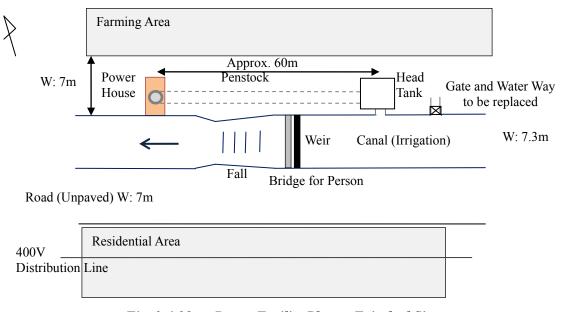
Power Facility Plan at Faizobod Site
